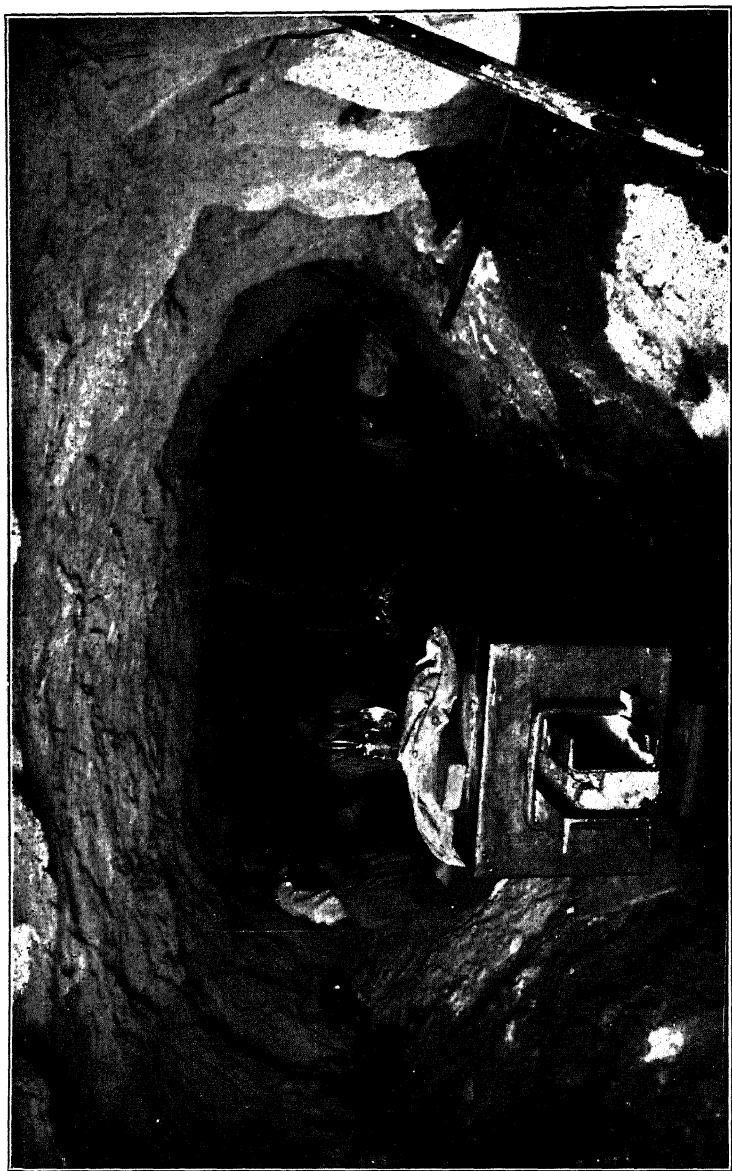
Heading with Drills at Work, Showing Rear of Carriage.
